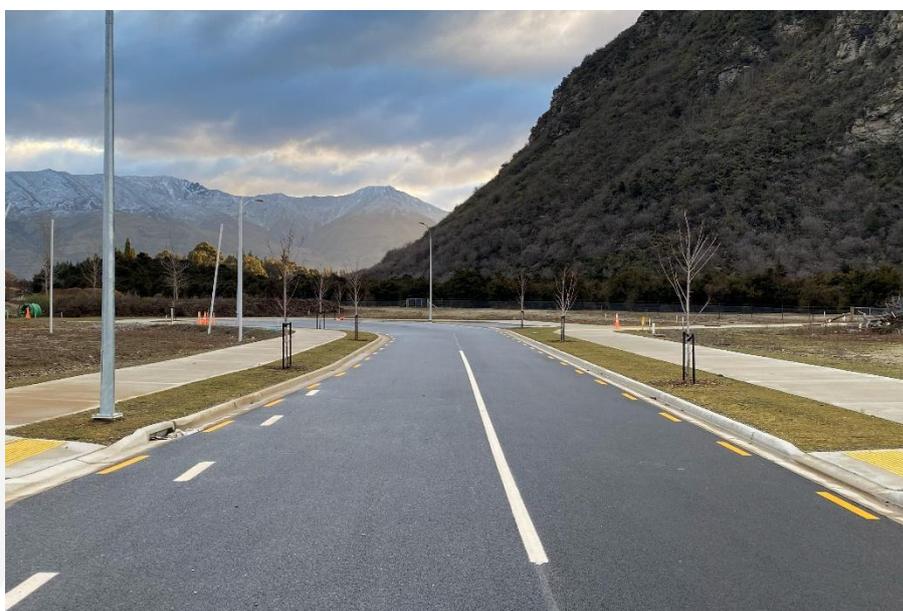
Junction Road / Mountain Road Intersection Looking South
